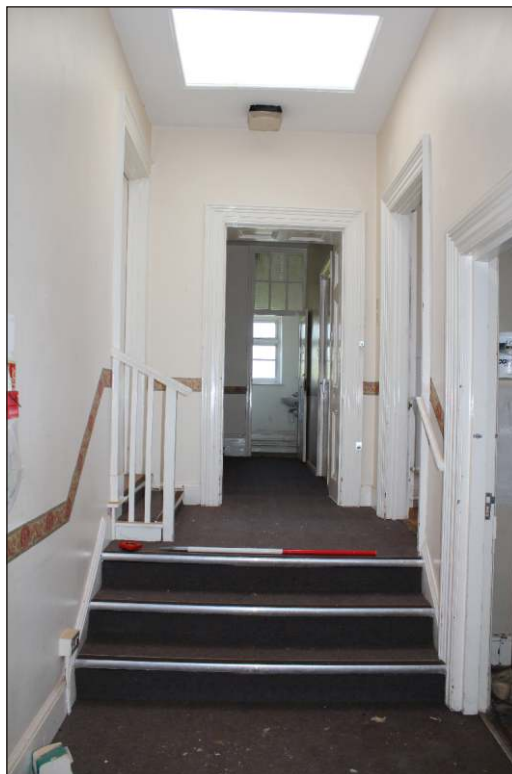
Corridor 3 showing steps and doorway architraves, looking north. (1m scale)
